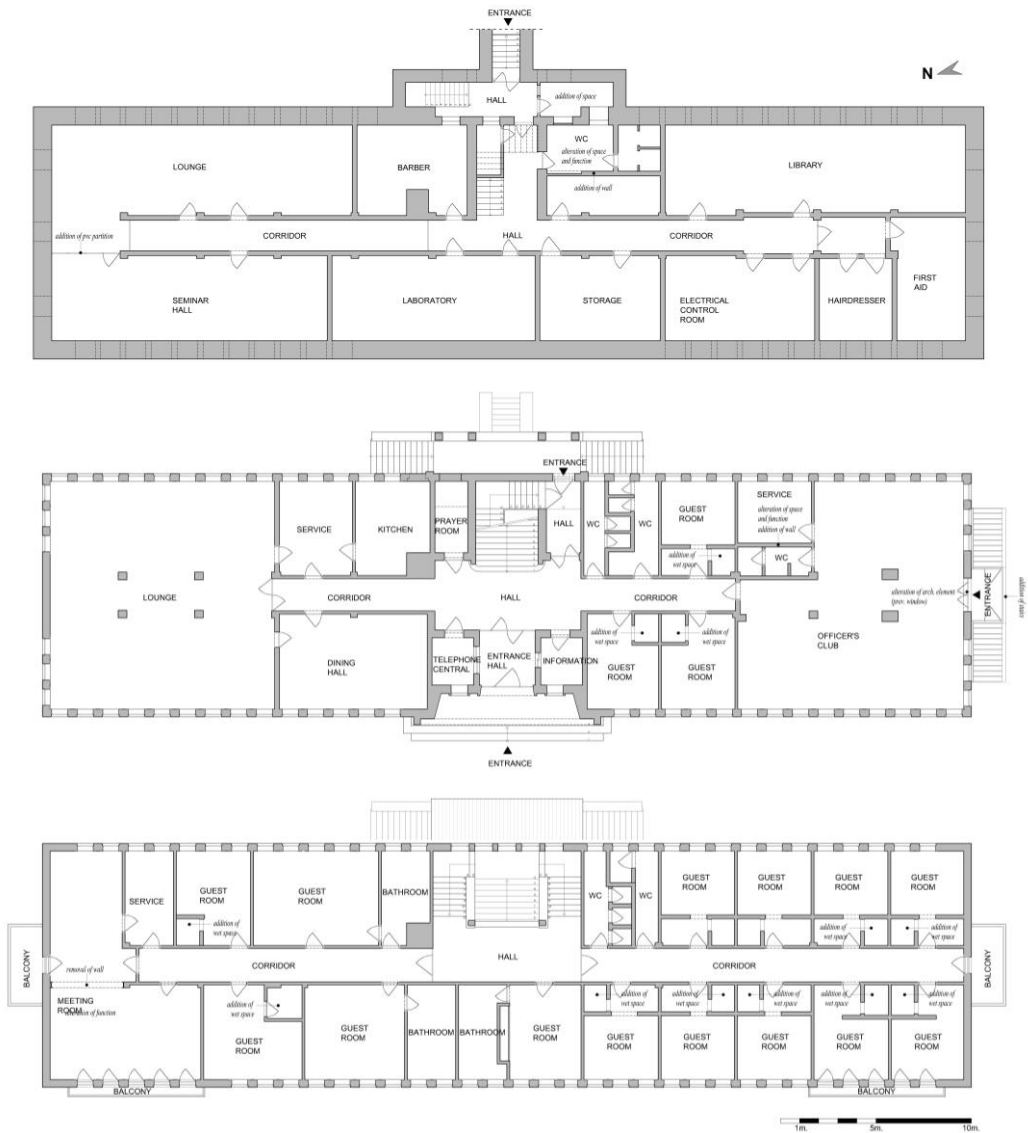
Basement, ground and first floor plans of New Guesthouse
